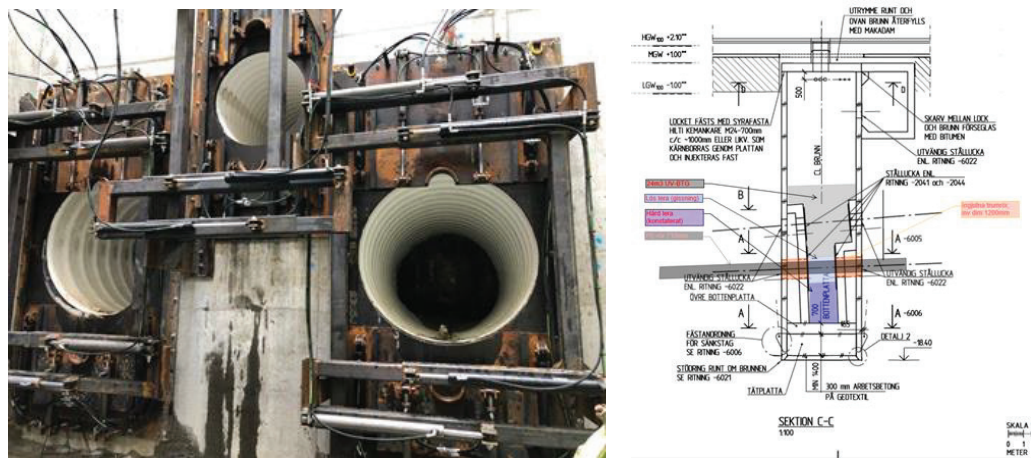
Hatch structure of the well and a section view of the well with the underwater concrete
